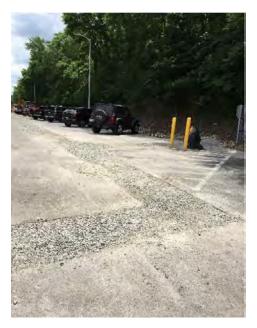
920 plateau area – near end of construction.
